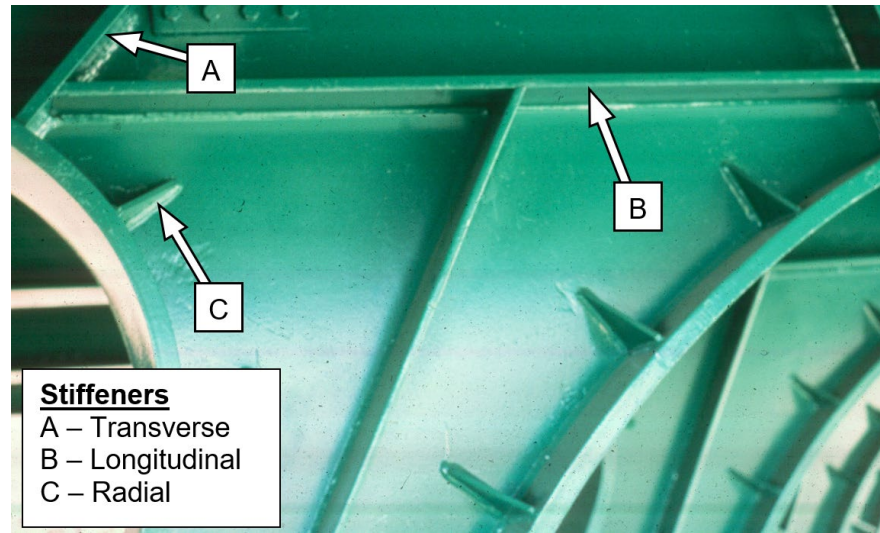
Transverse, Longitudinal, and Radial Stiffeners on a Frame Knee
